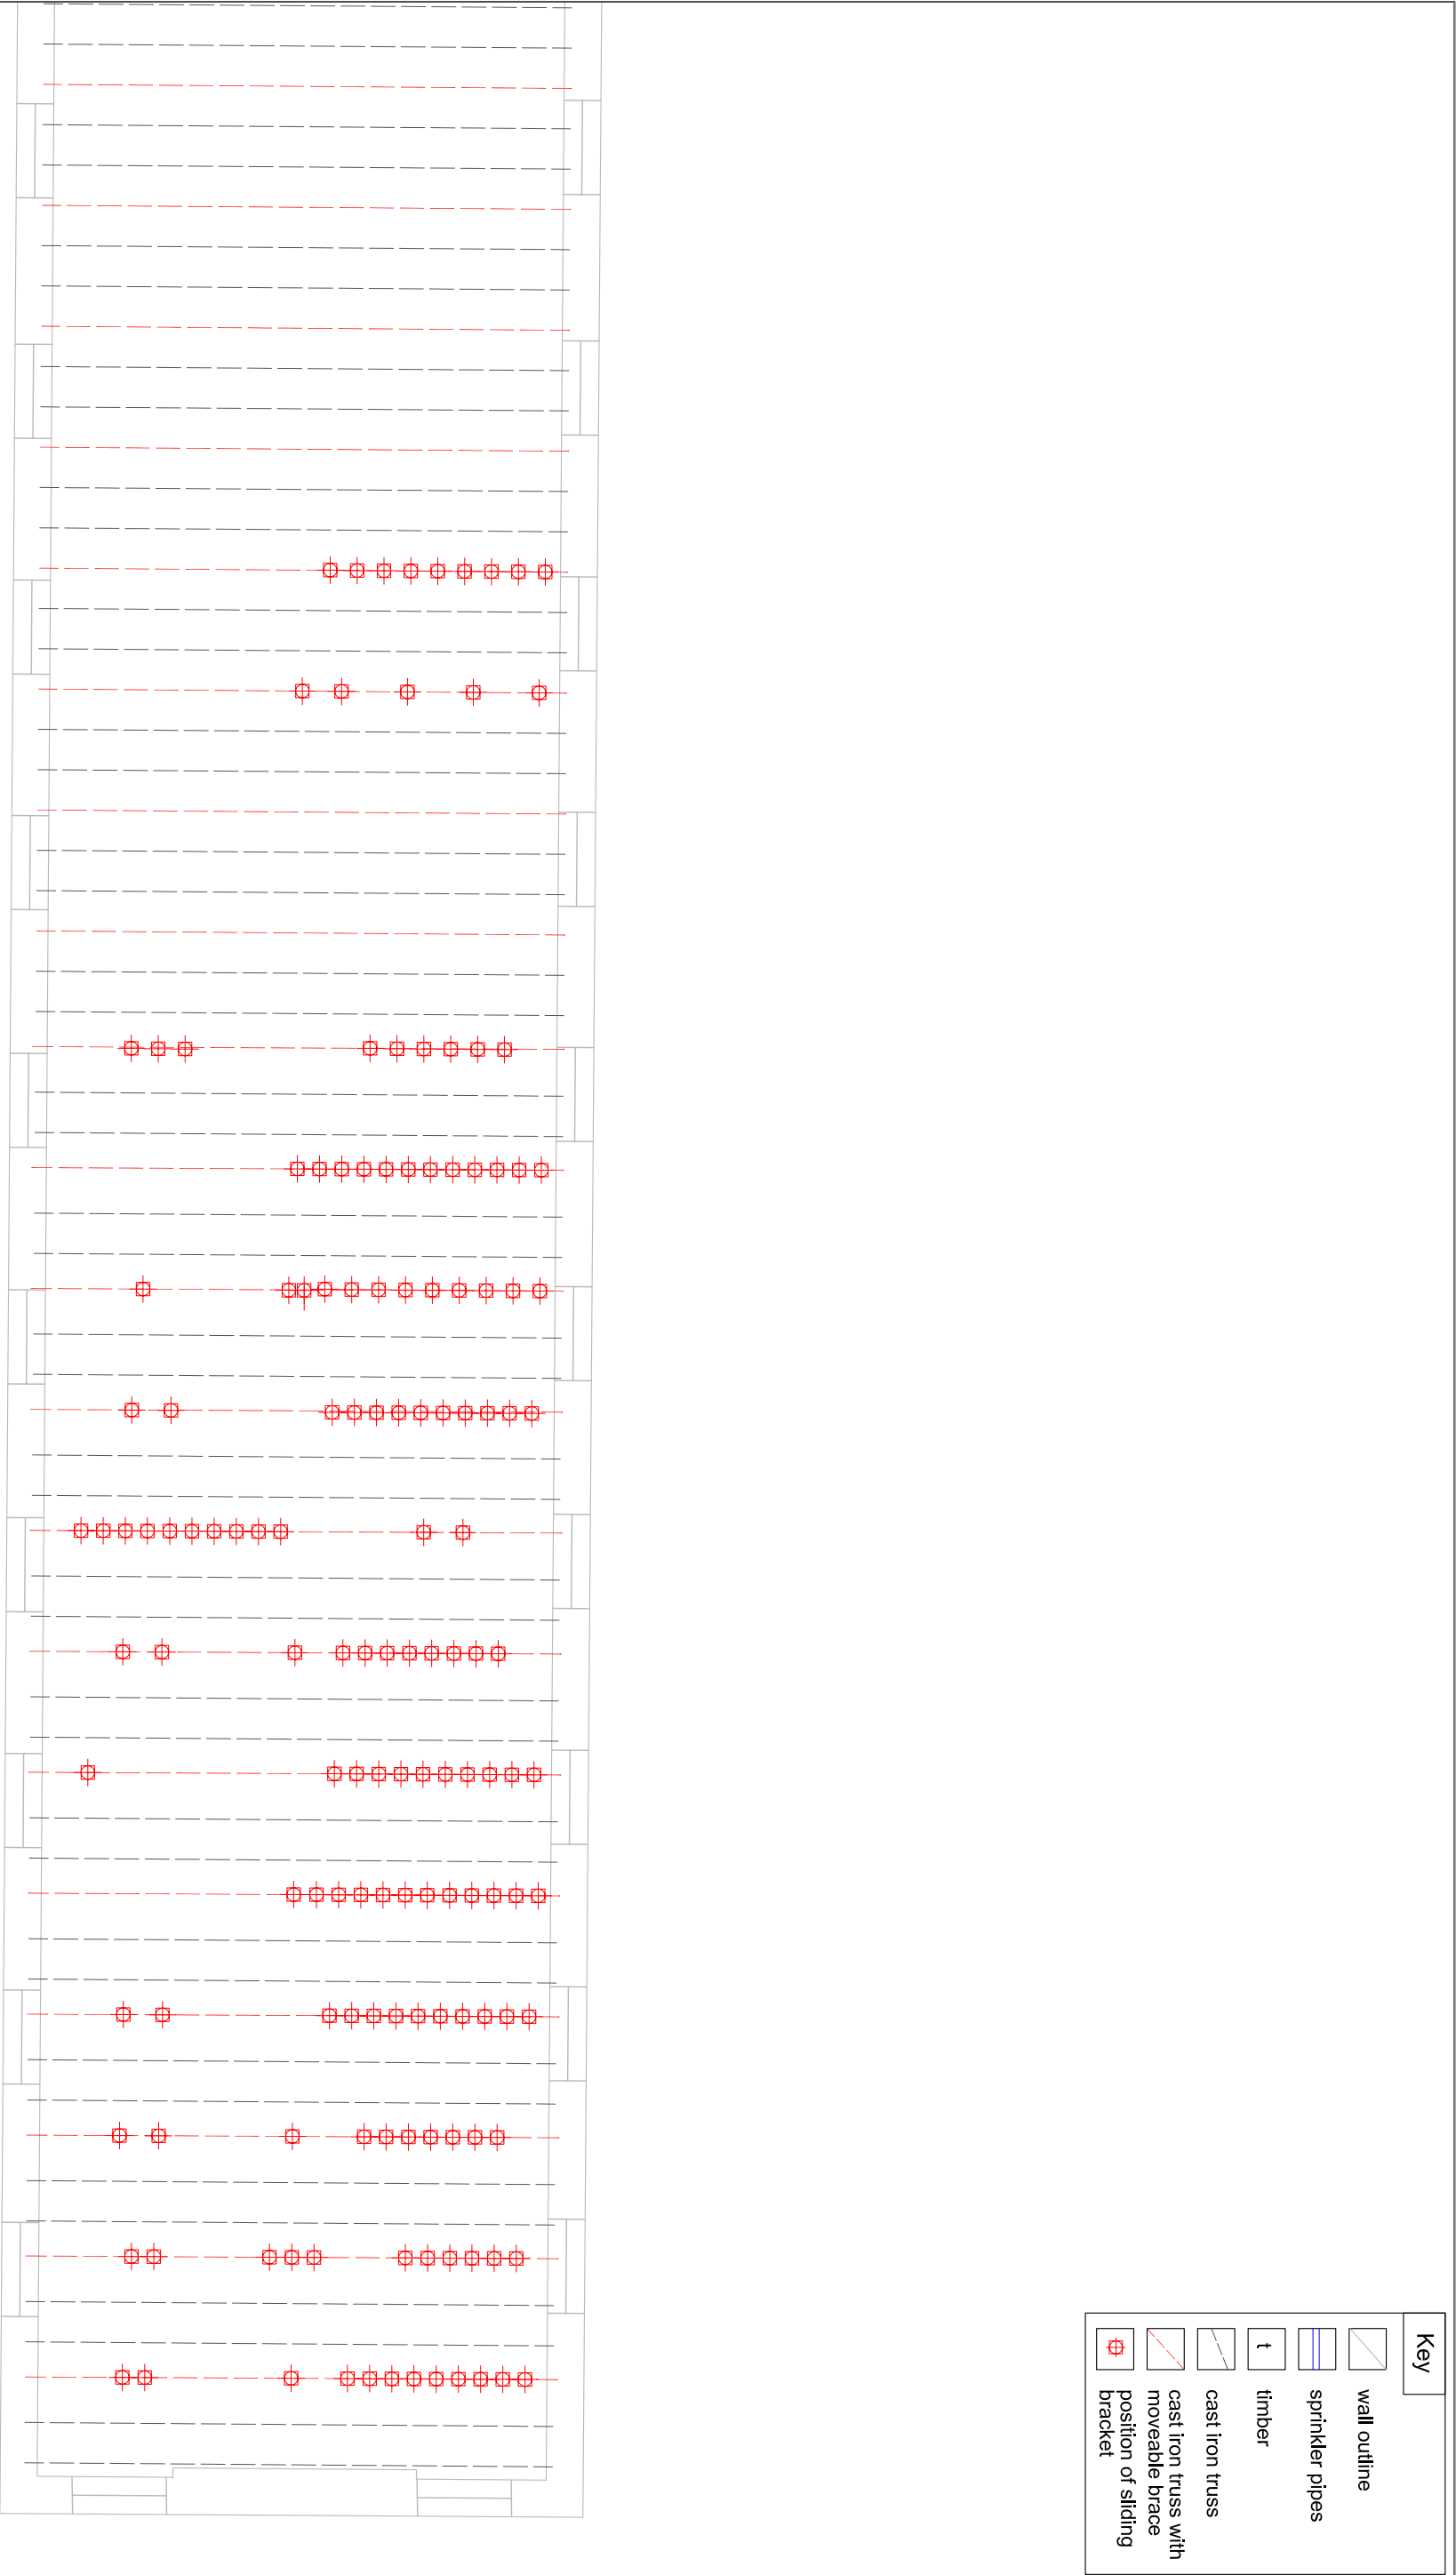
Fourth floor, reflected ceiling plan of Range A (east end)
